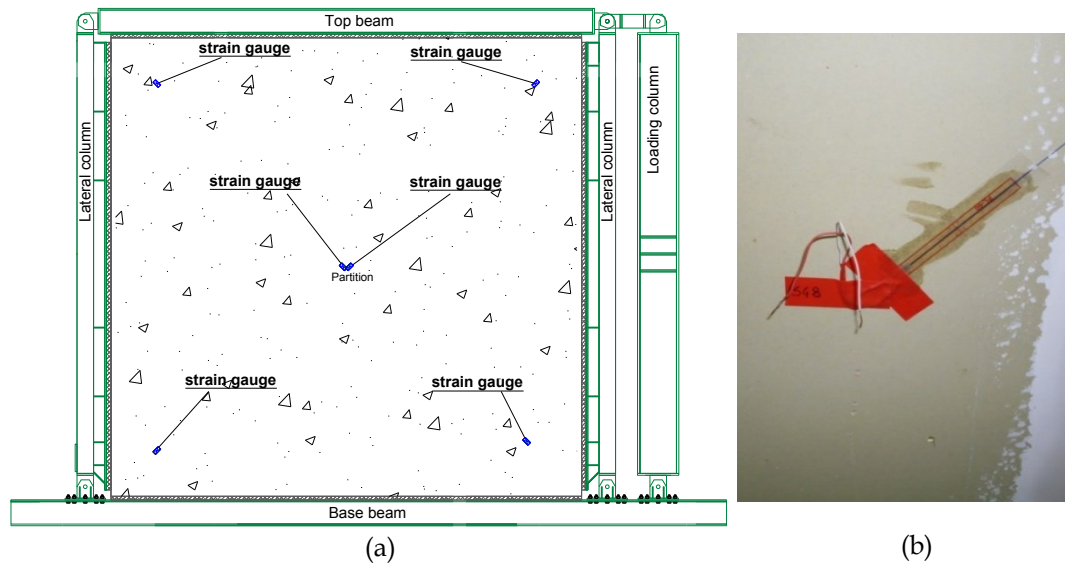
(a) Strain gauges disposition in the external part of the specimen (plasterboard panel) and (b) particular of the strain gauge installation
